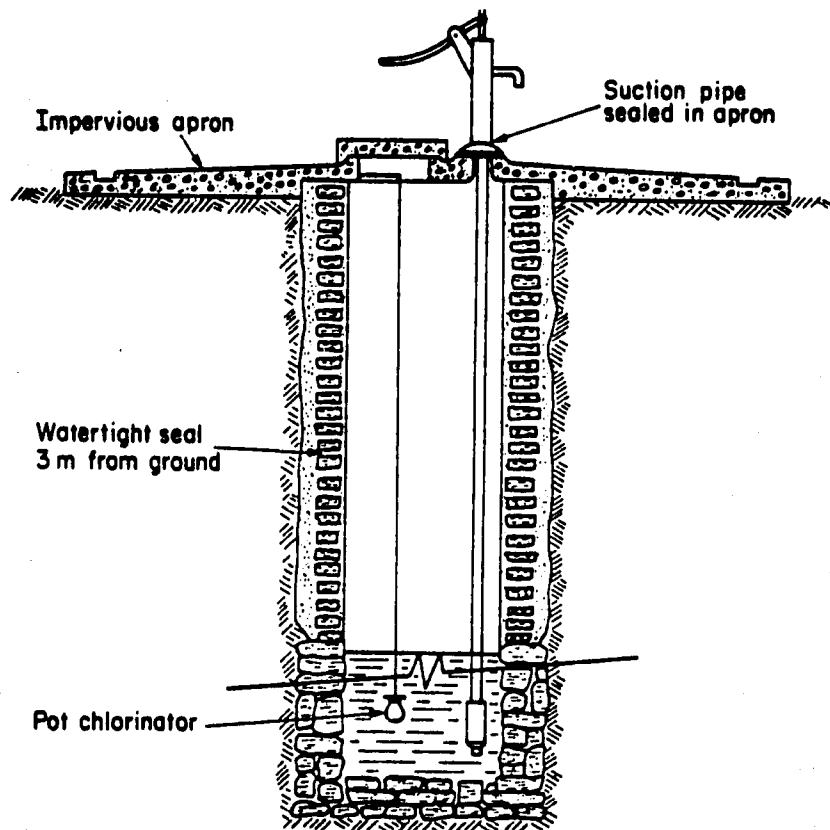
Dug well with hand-pump and sanitary protection.
